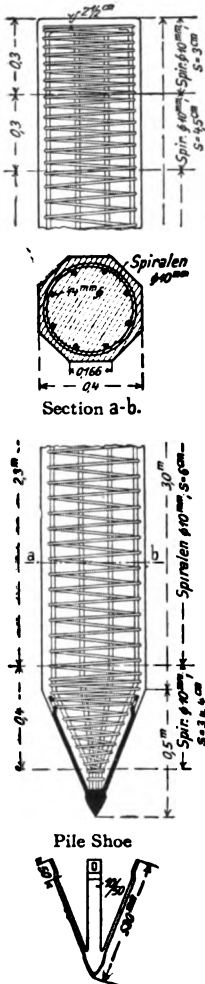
Reinforced concrete pile for the top of the canal in Mulhausen in Alsace.
